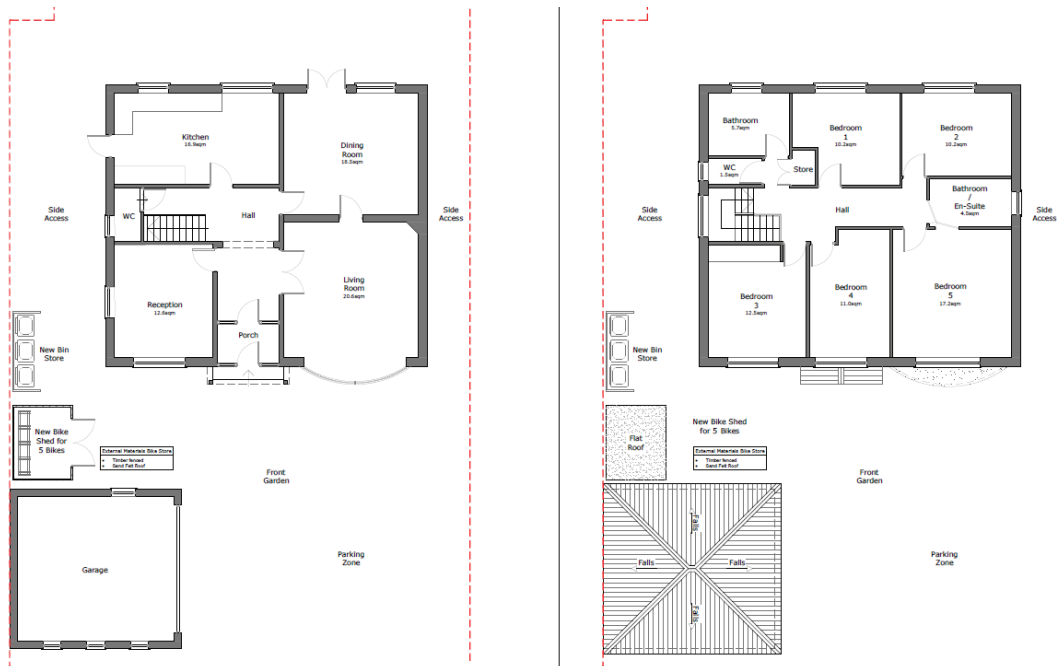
Proposed floor plans (please note – larger version of plan can be found in the Committee Plan Pack)
